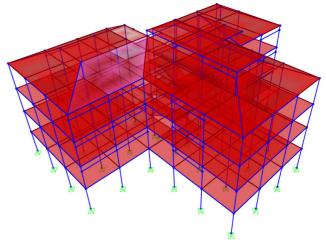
Isometric view of the structural model implemented by SAP2000v.18.
